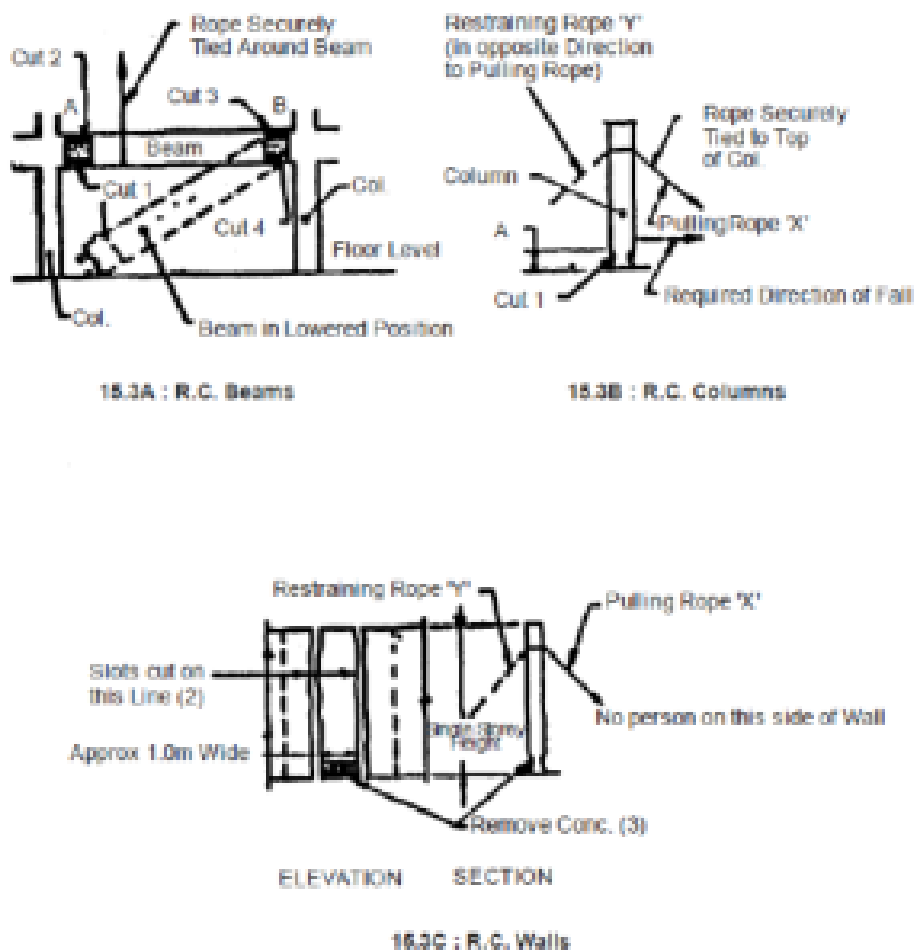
Hand Demolition of In Situ Concrete Structure
